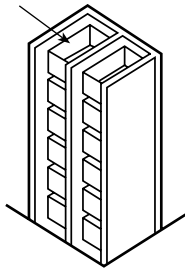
Tote box storeroom showing arrangement of sprinklers and baffles and section of tote box storage rack.
